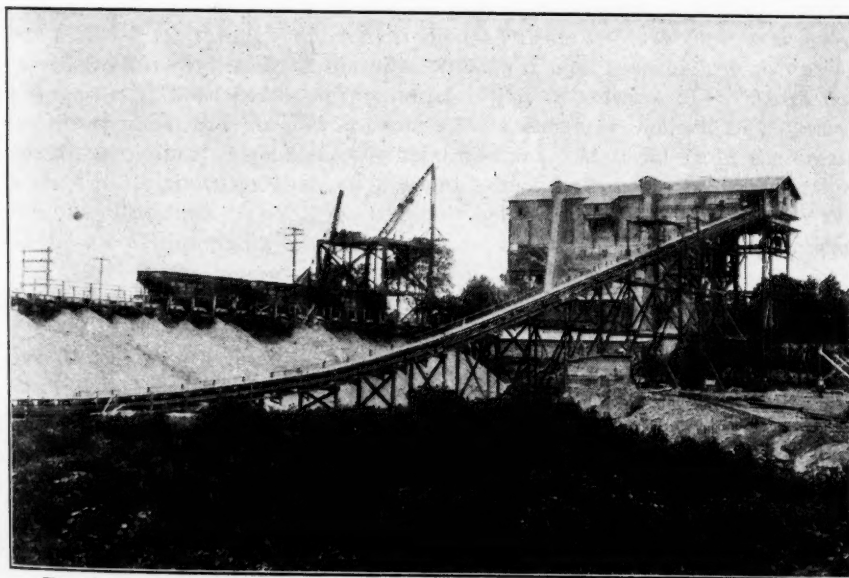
VIEW OF MIXER PLANT WITH BELT CONVEYOR, ALSO, SHOWING PART OF SAND STORAGE TRESTLE.
